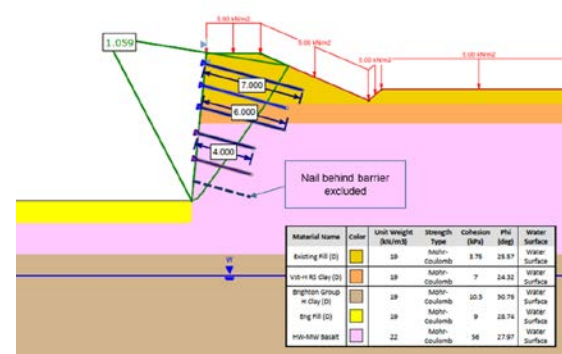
Soil Nail Wall Stability Analysis with the bottom nail excluded
